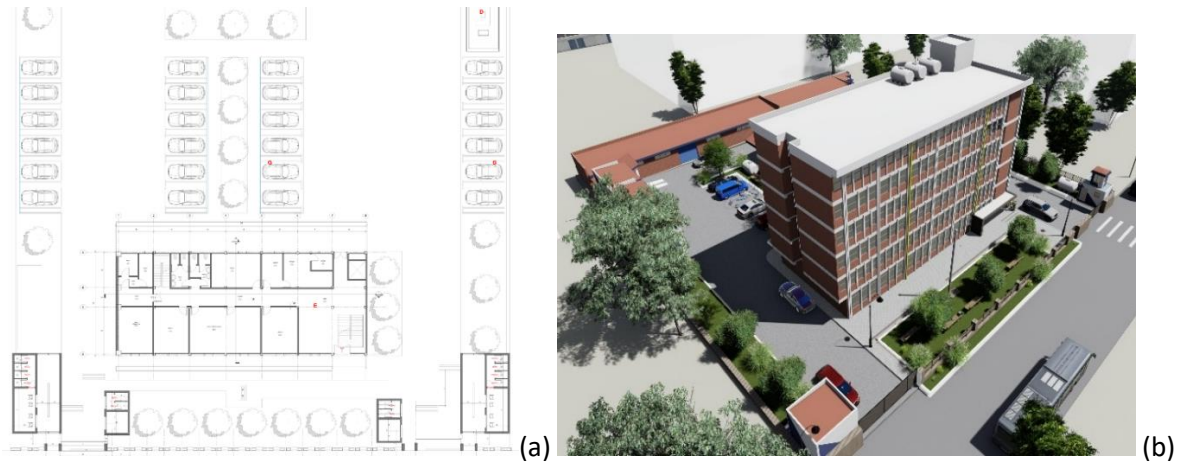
ENEB ((a) Ground Floor plan and (b) Areal view) (Source: ENEB, 2021)
